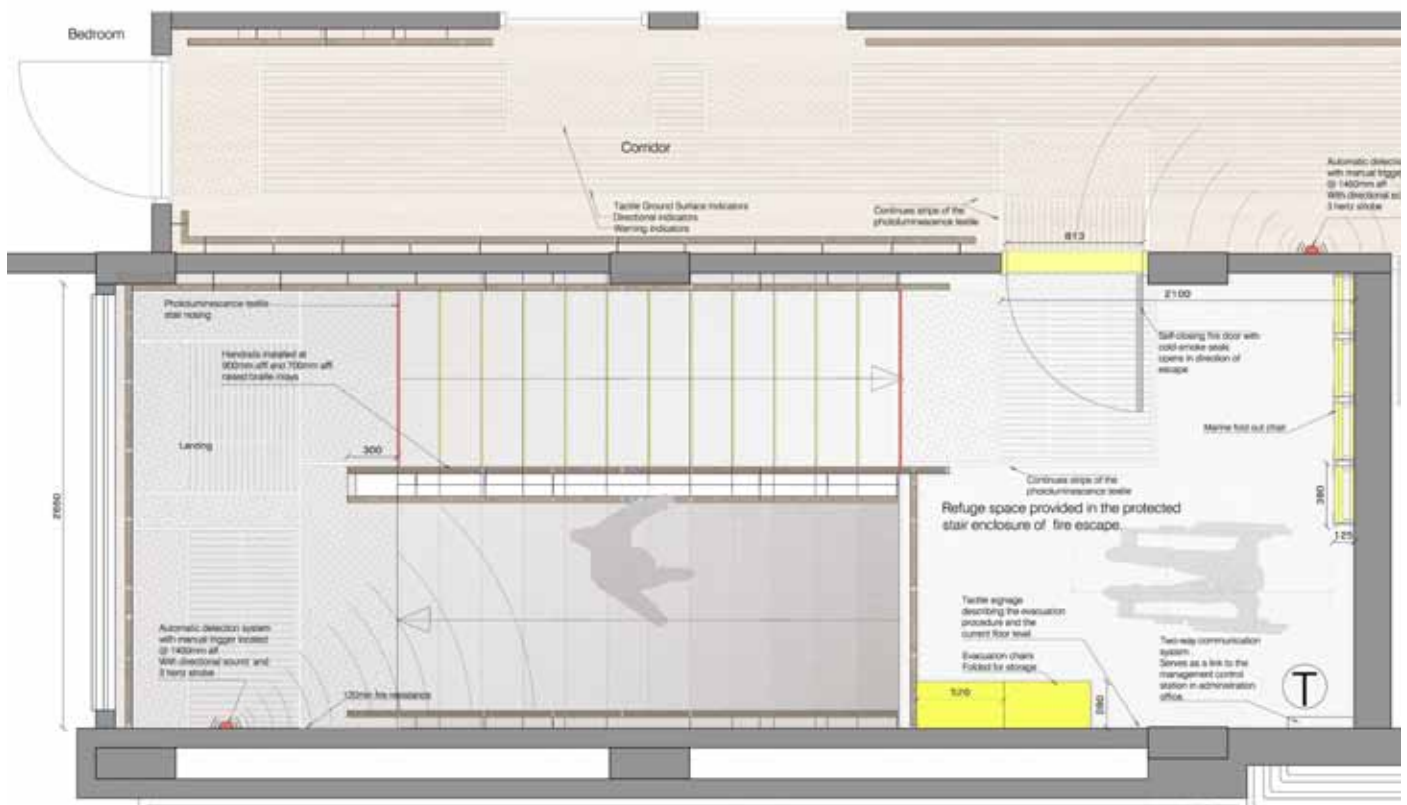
Plan of fire escape with new refuge space n.t.s. (Author, 2013)
